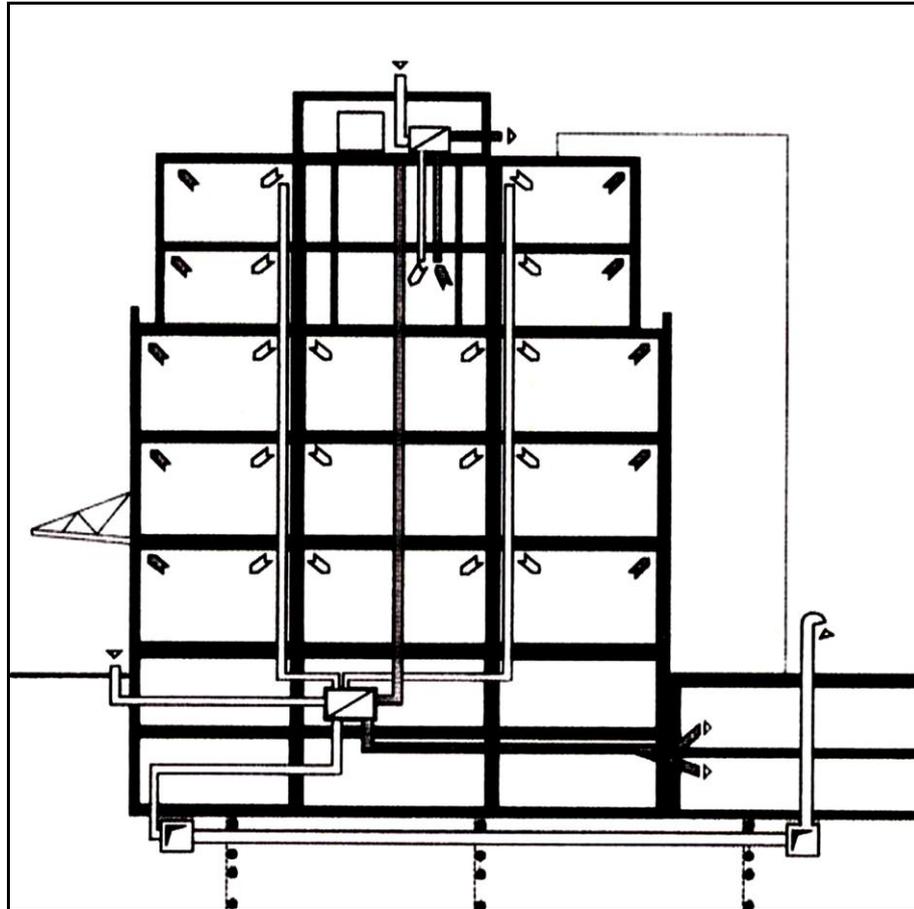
Buried pipe system used in schwerzenbacherhof building - Germany^[44]
